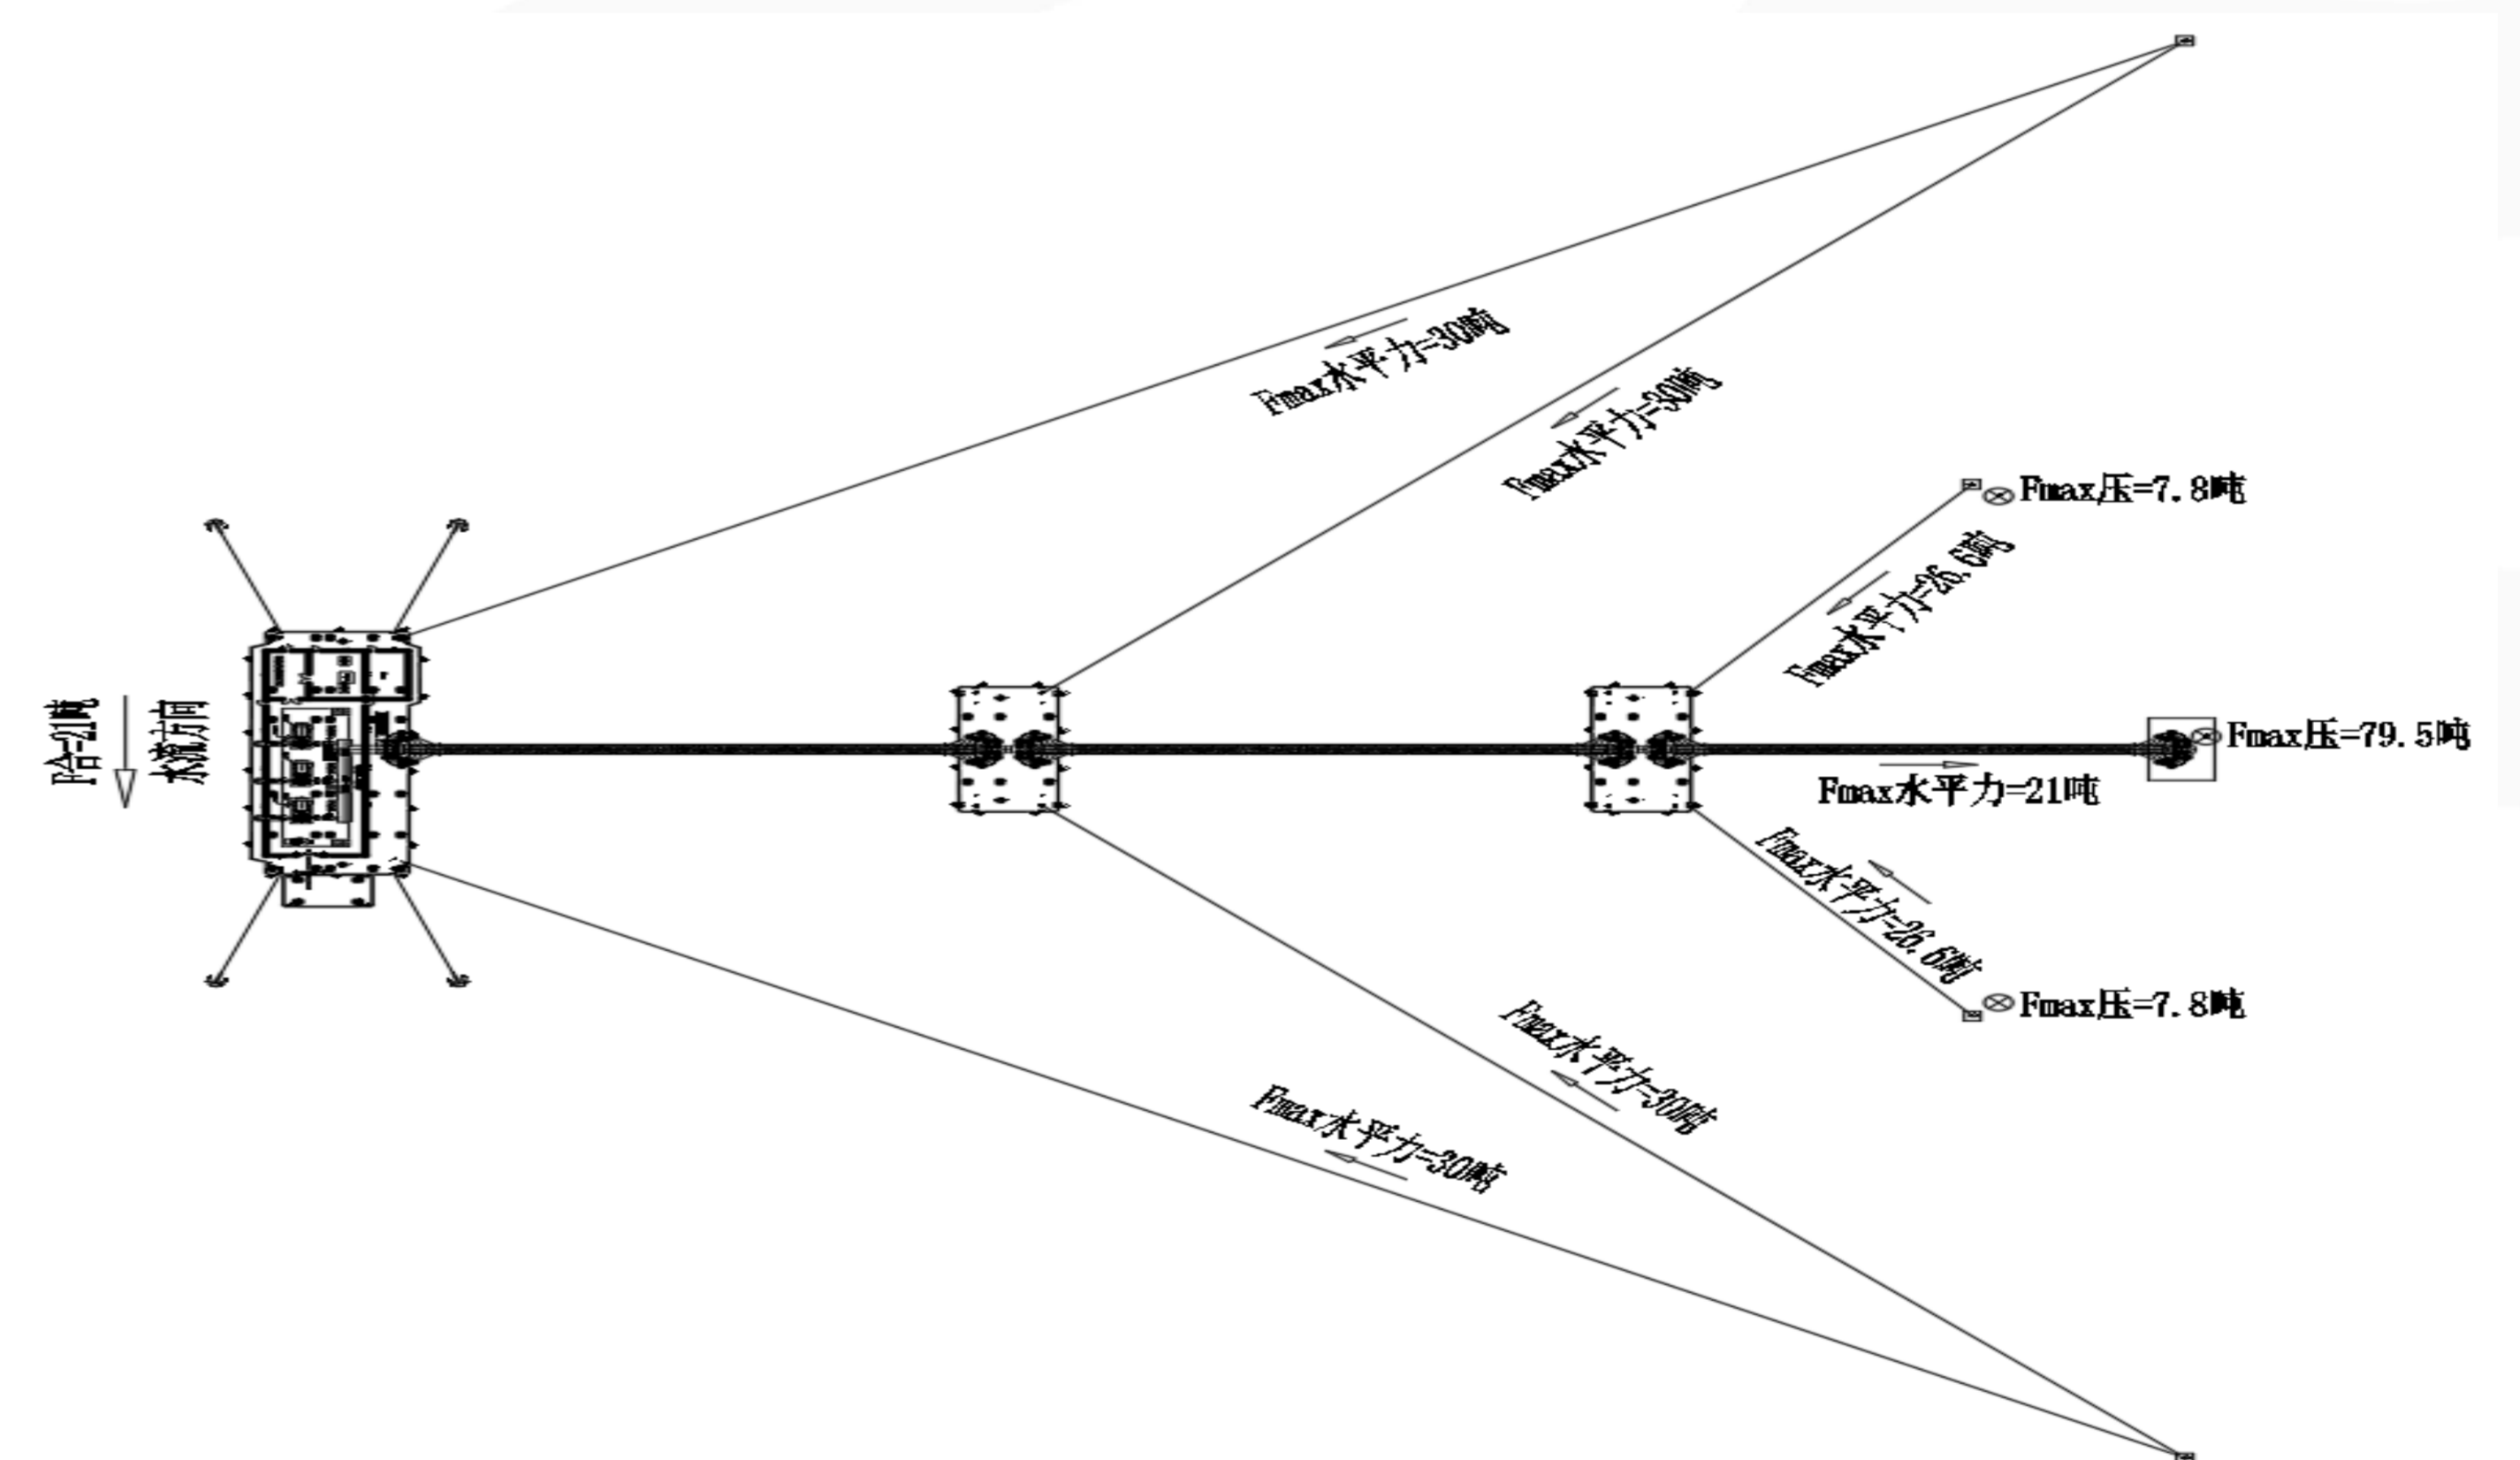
Schematic diagram of anchor pier stress in floating boat pump station
